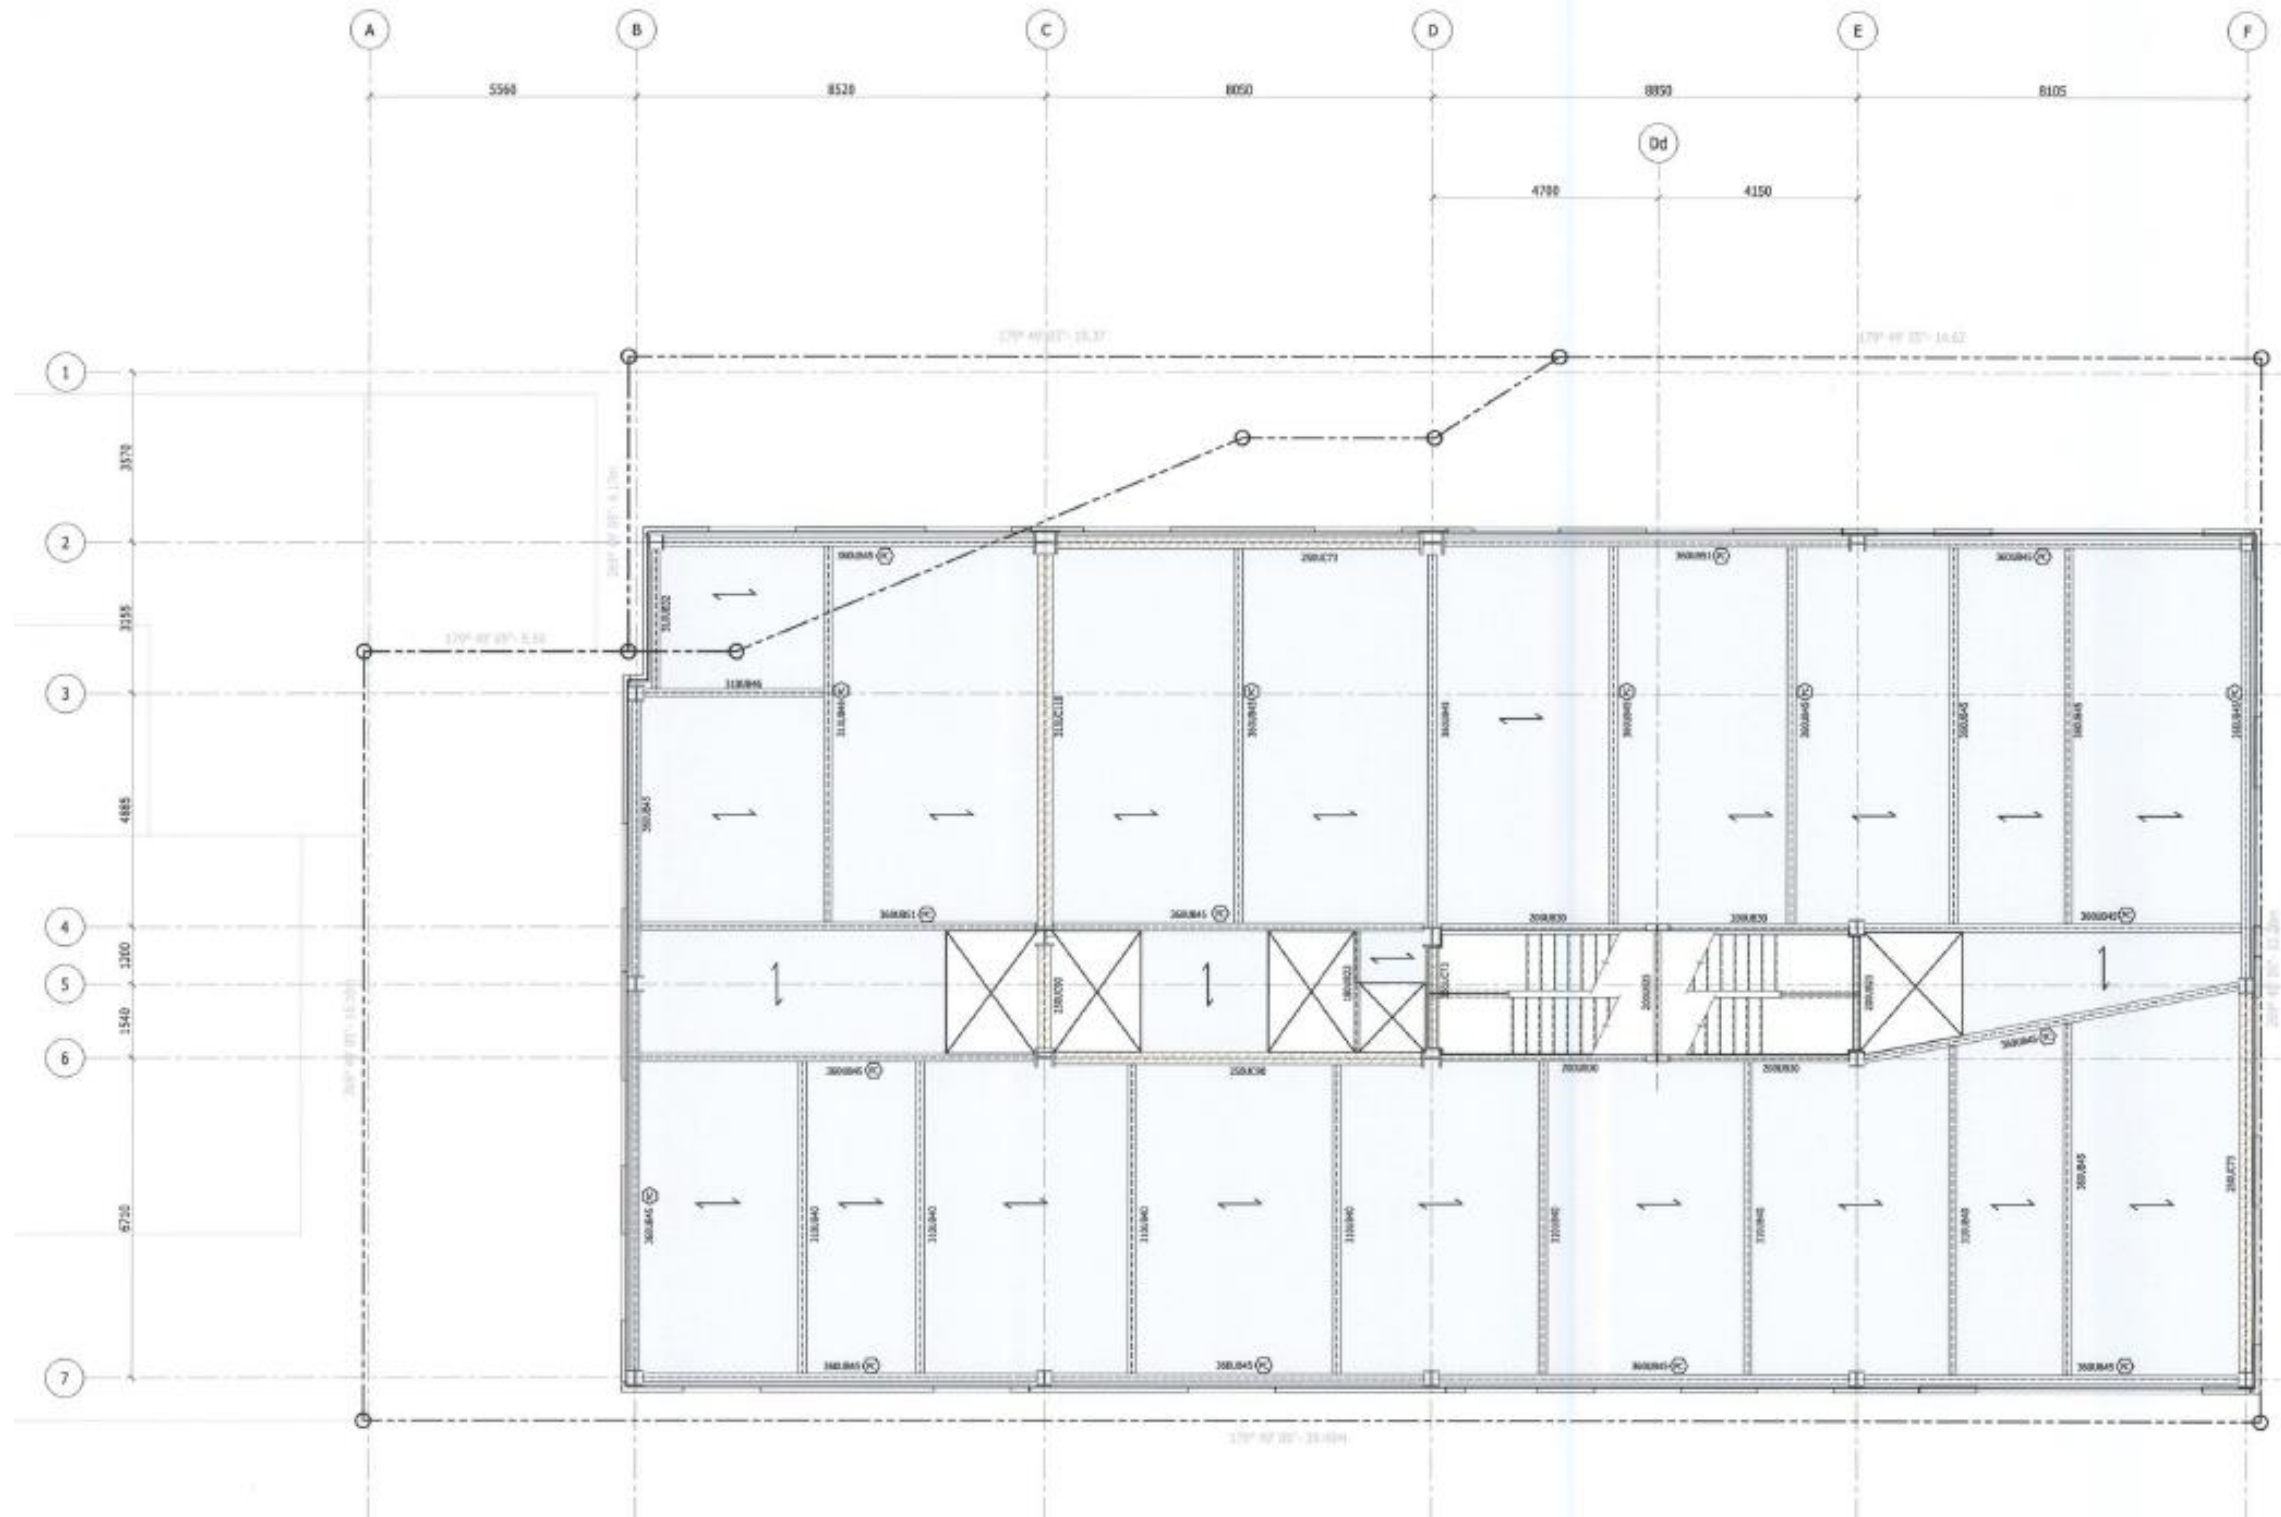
Structural Plan Level 9 (Christchurch City Council 2016c)
